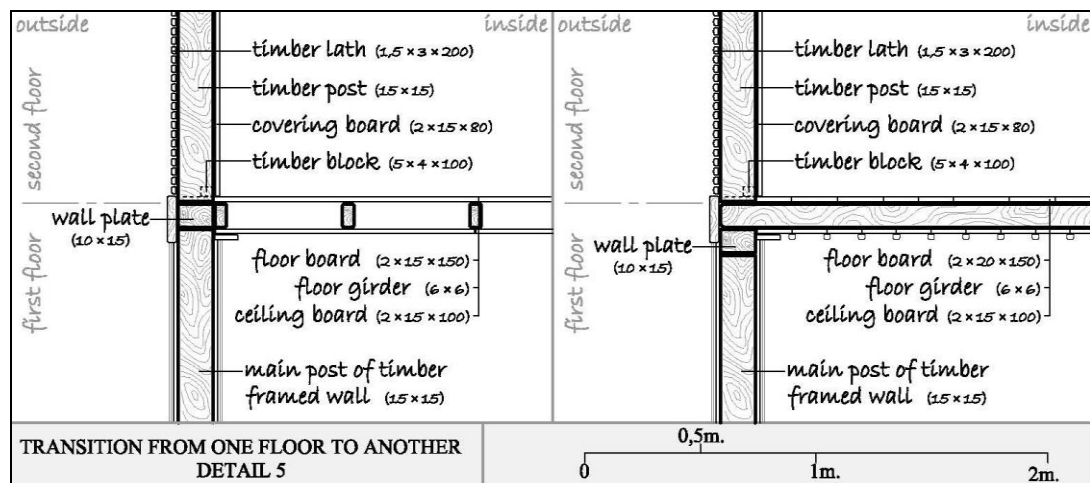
, Detail of use of timber frame in the lower floor and timber post in the upper floor; placement of the post on the wall plate of the upper floor timber frame wall (left), placement of the post on the floor girder (right)
